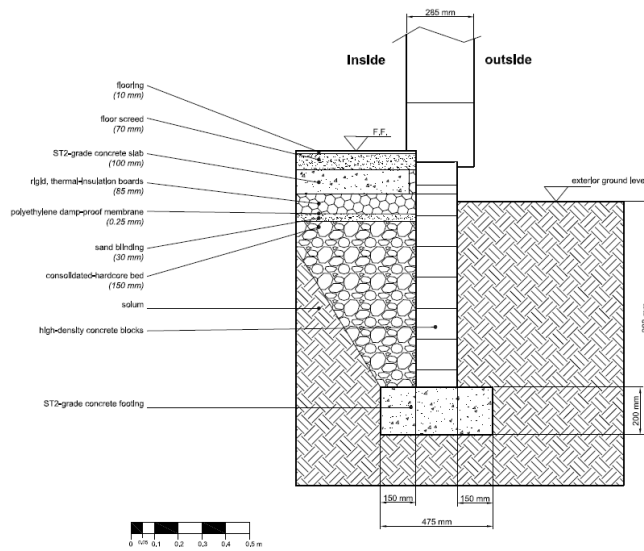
Foundation D1 (strip foundations and ground-supported floor), vertical section.
